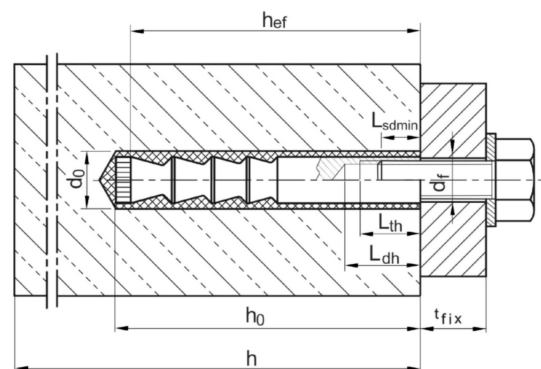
Injection System W-VIZ with anchor rod W-VIZ-IG: On-site geometry, from [P1]
